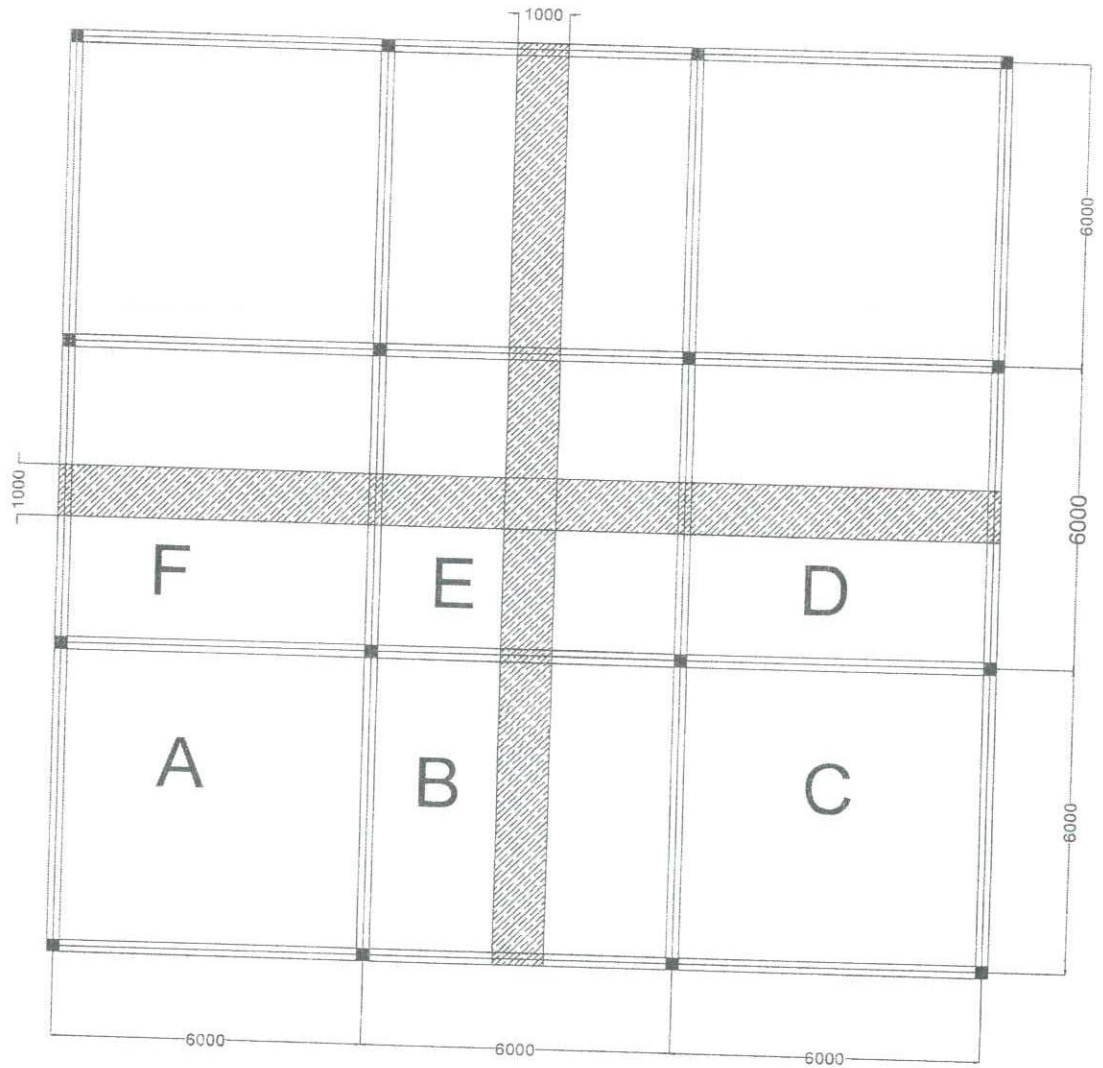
Plane view of the slab panel and 1m width strips to be considered for moment distribution
